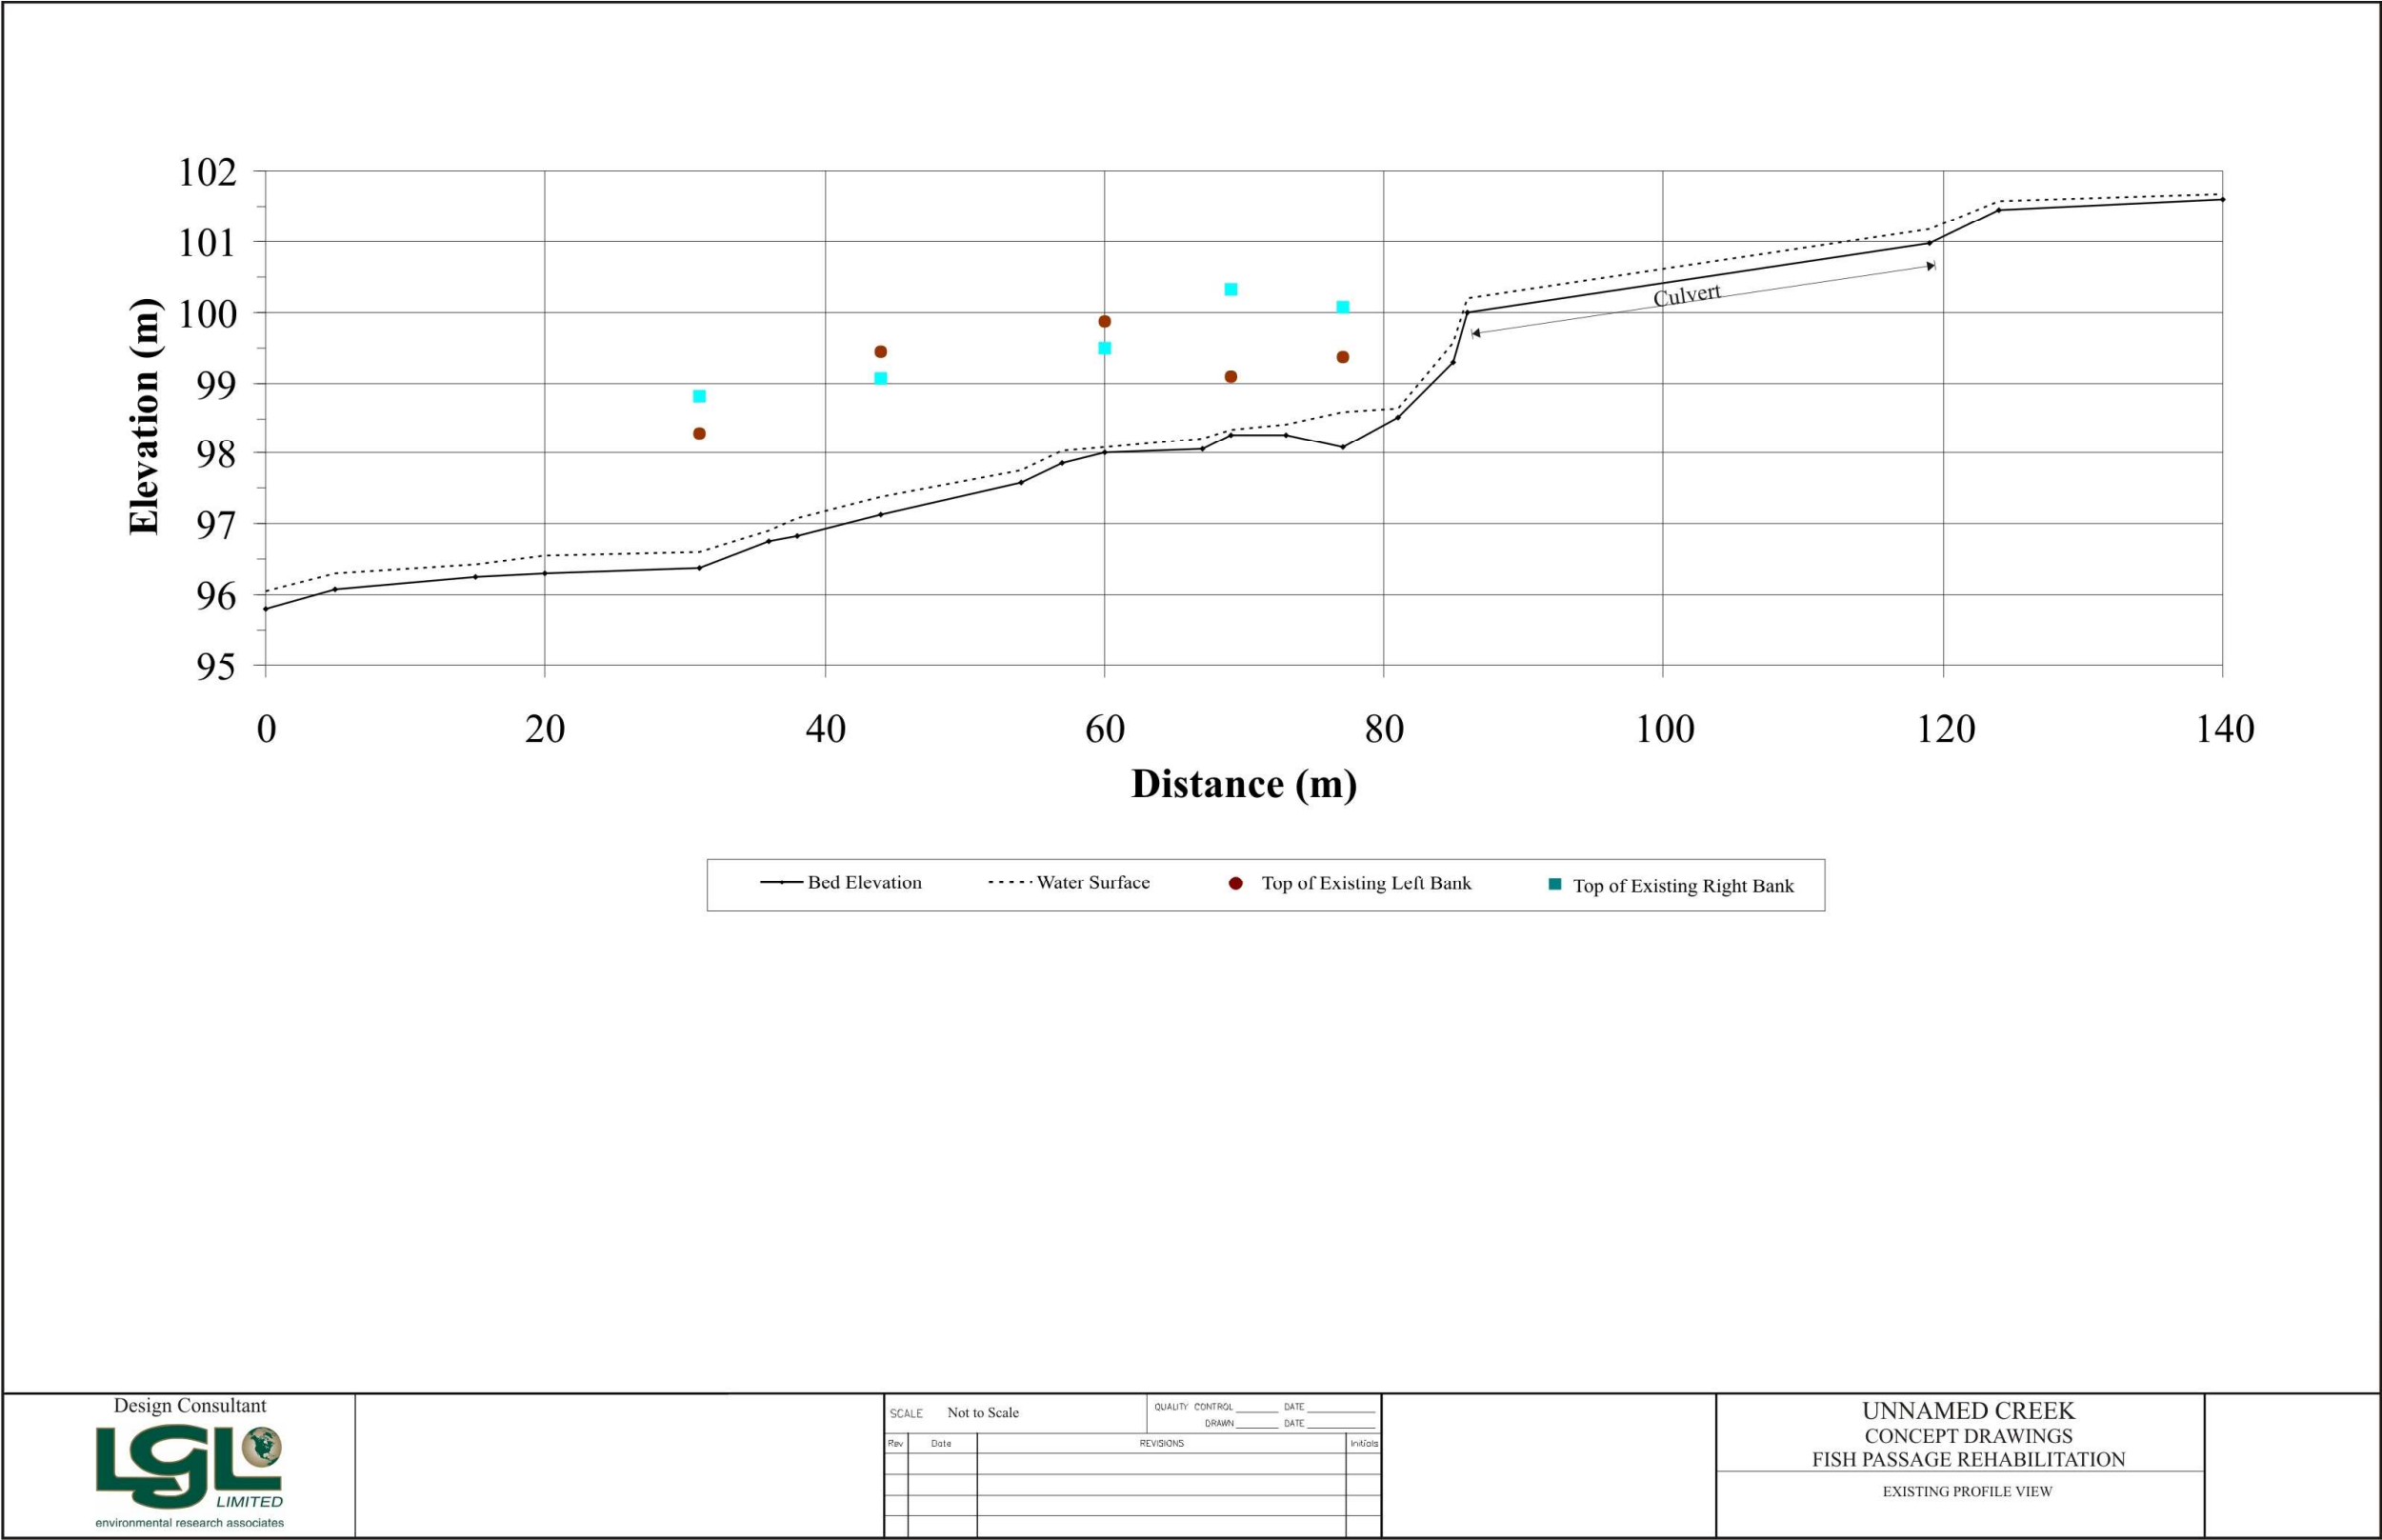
Existing profile of Unnamed Creek adjacent to the culvert crossing on Road 190.
